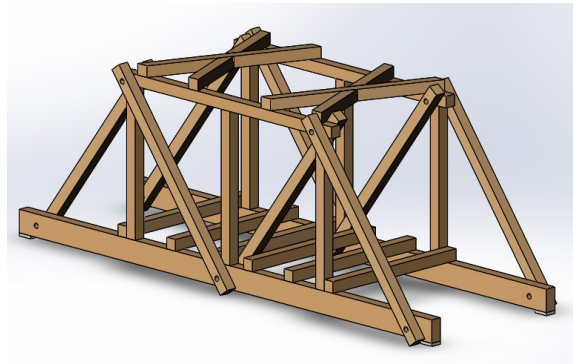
Dimetric View of Bridge CAD in SolidWorks
